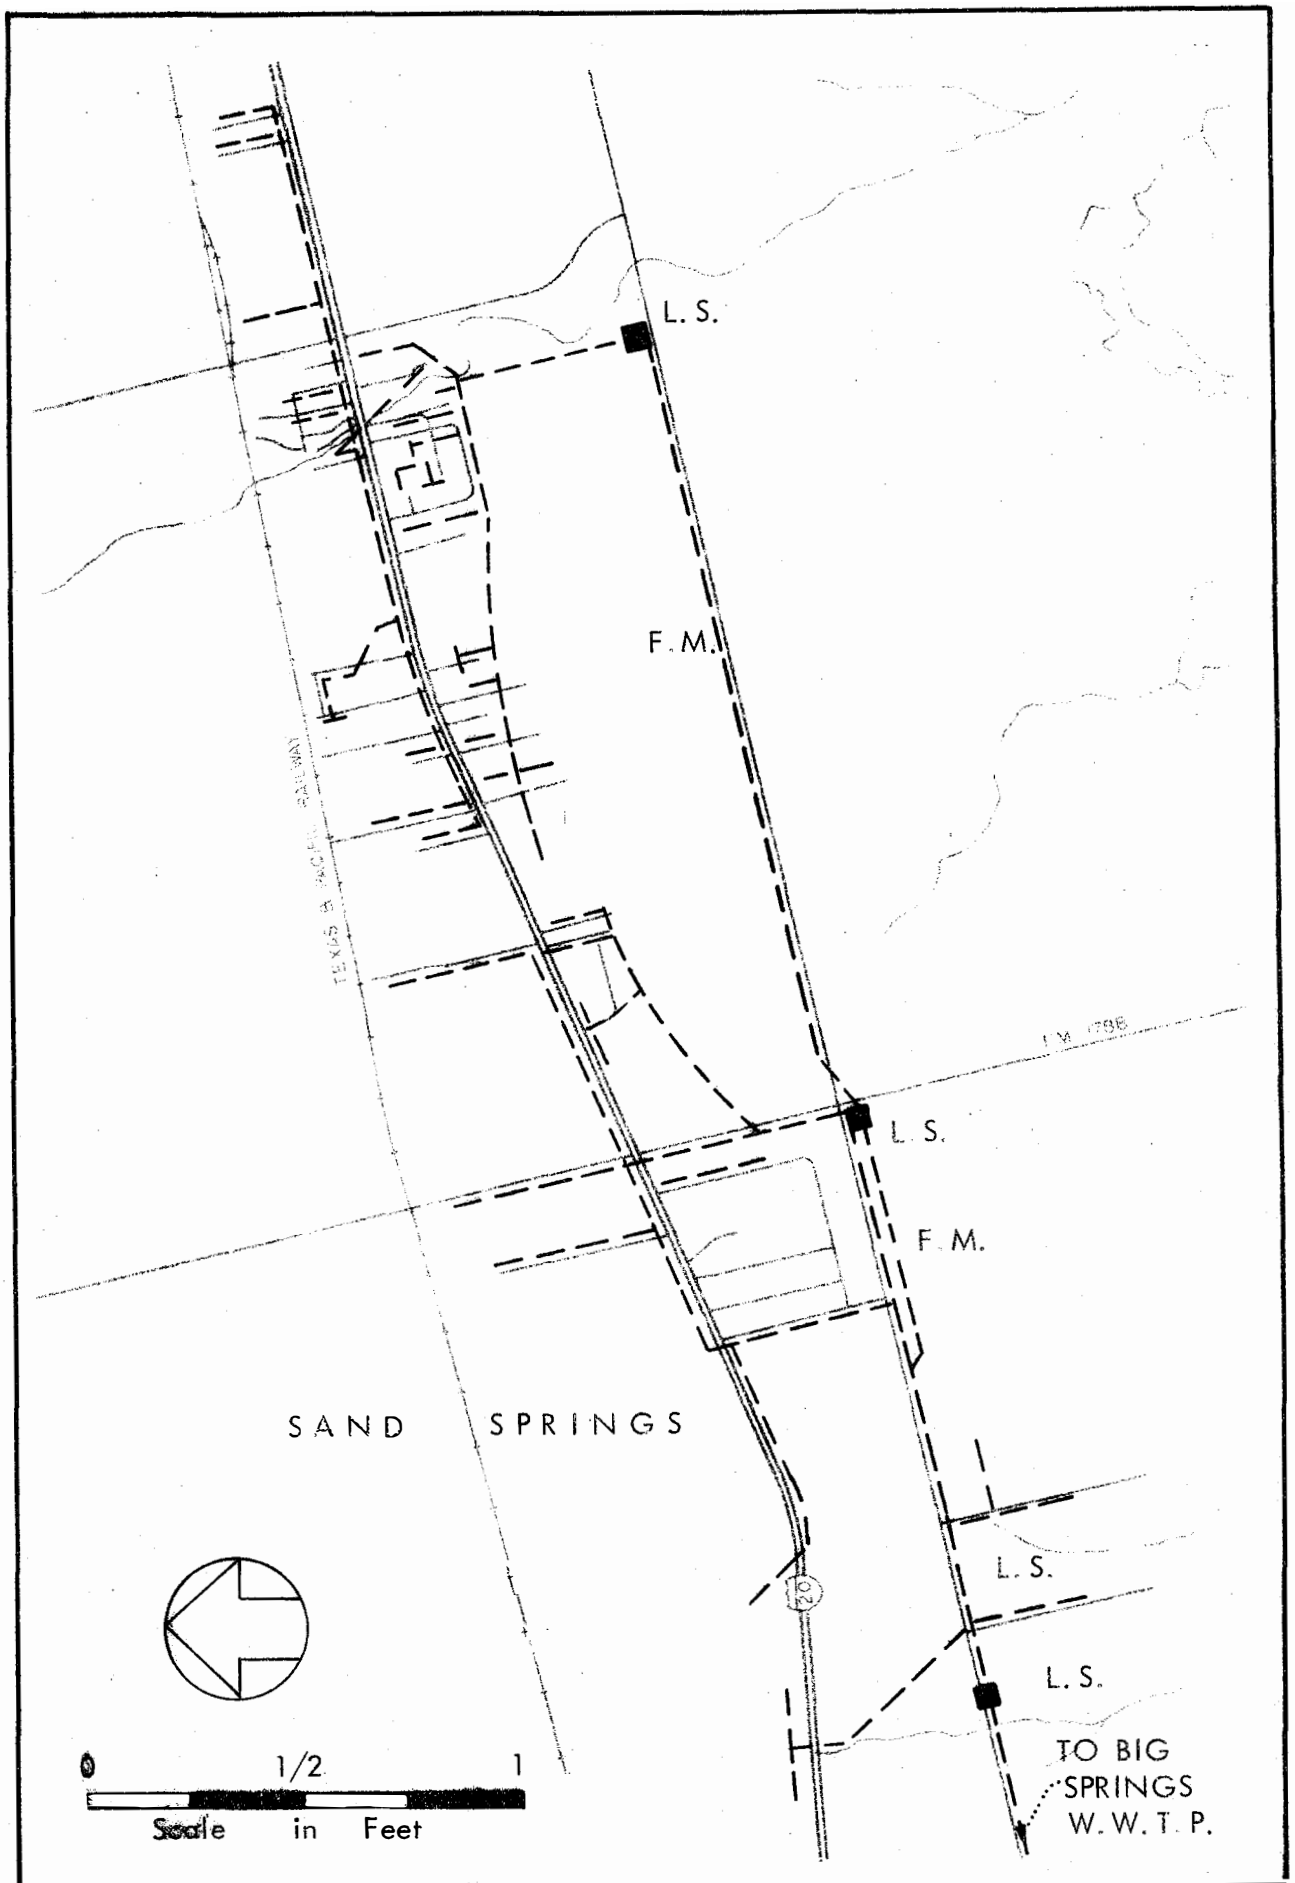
Proposed collection system for Sand Springs Area, Alternative 1
